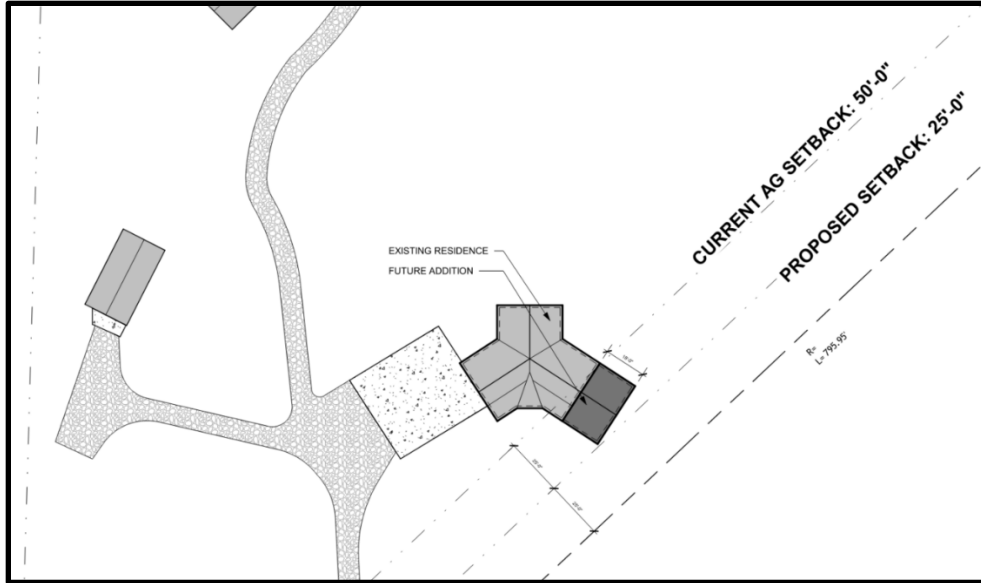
Plot plan showing proposed building addition and 25' side yard setback.
